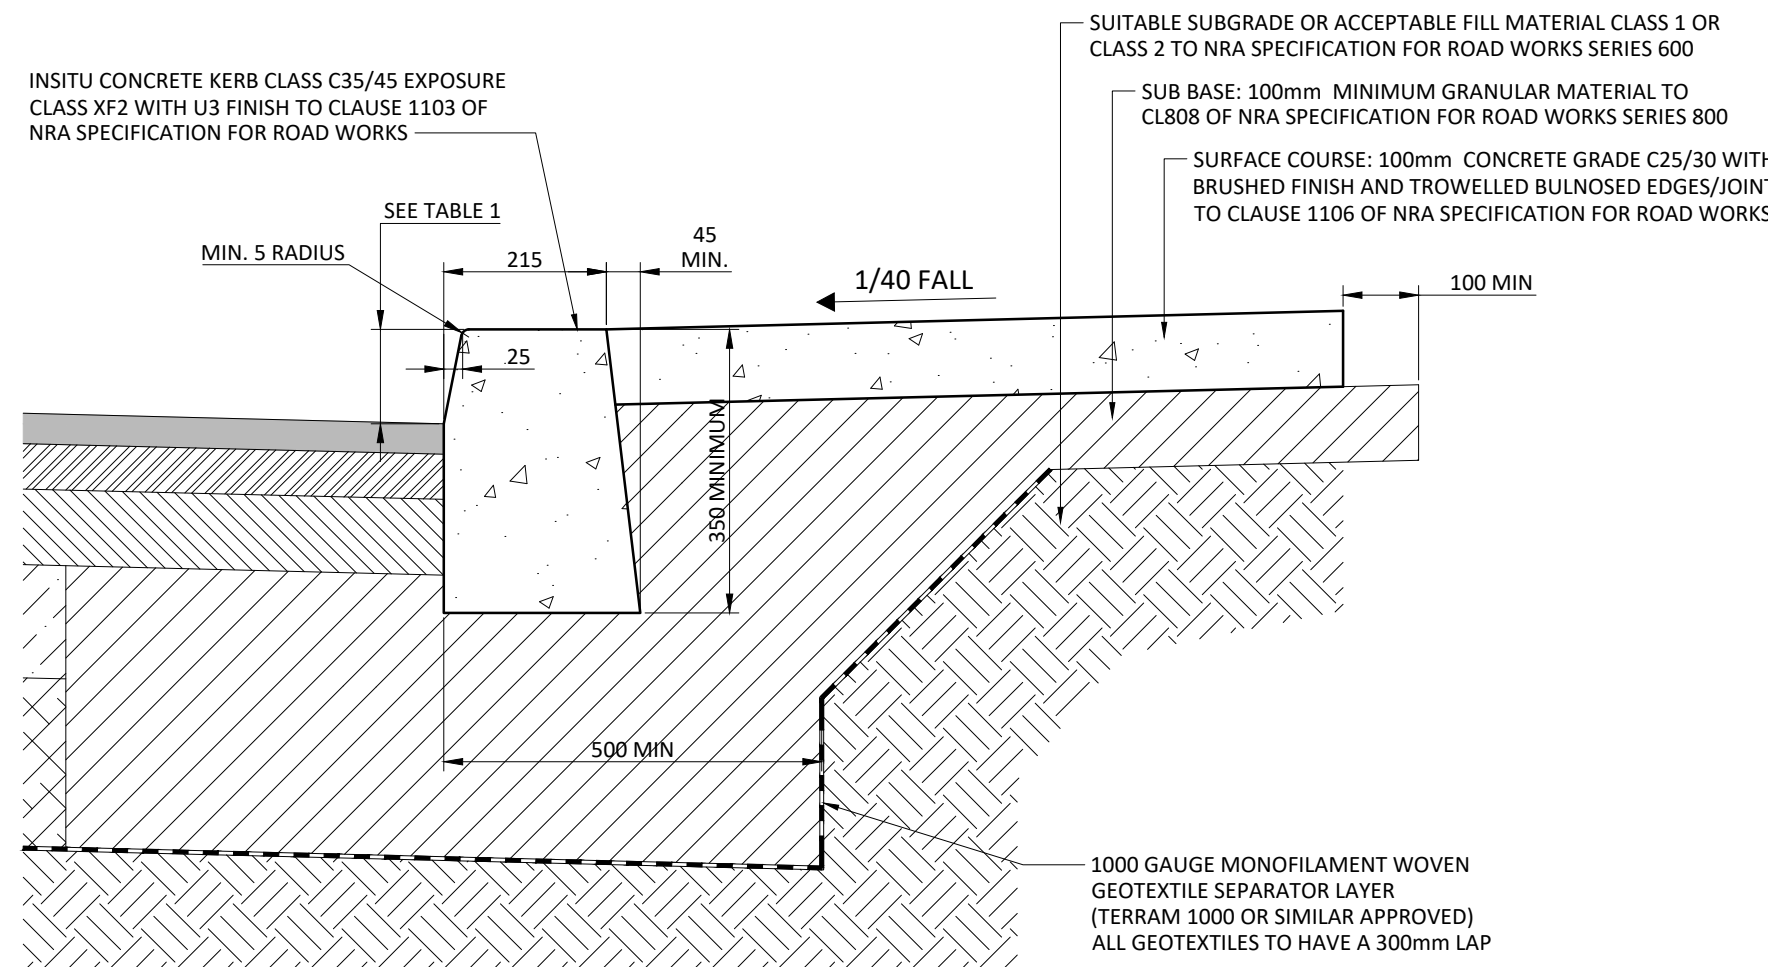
DETAIL A - CONSTRUCTION DETAIL FOR JOINT
